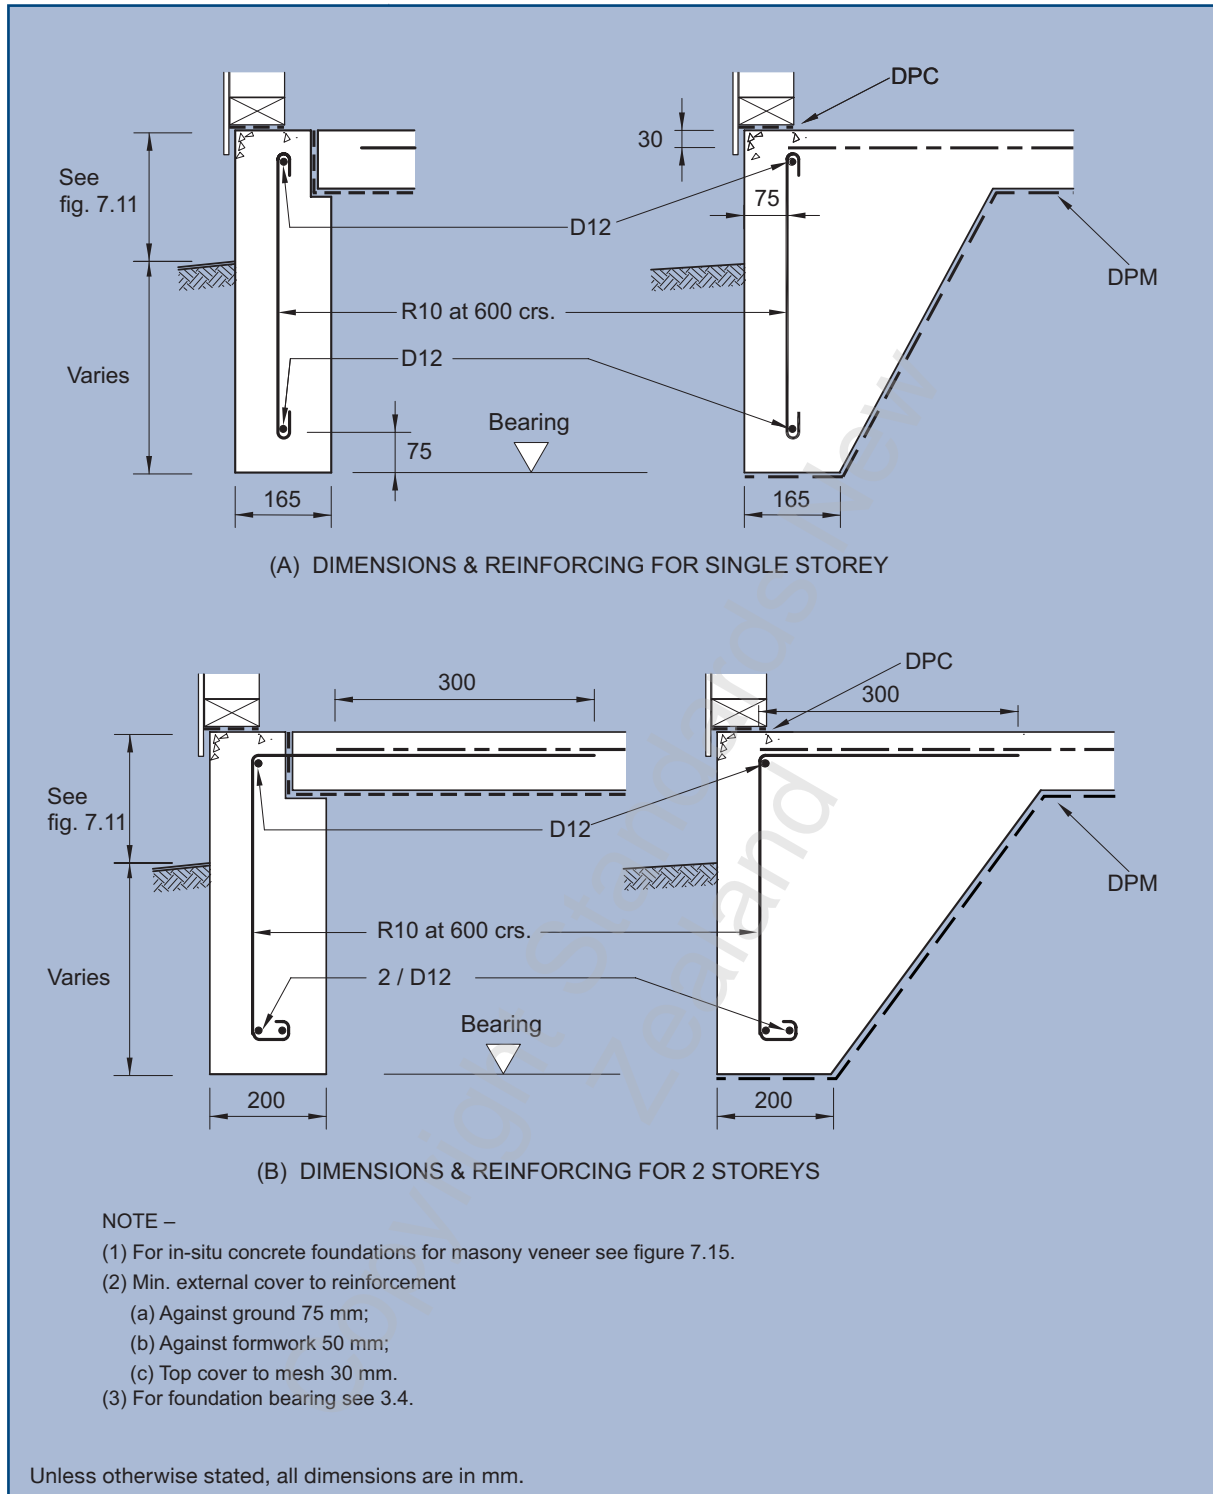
Foundation edge details – In-situ concrete (see 7.5.2.3)
